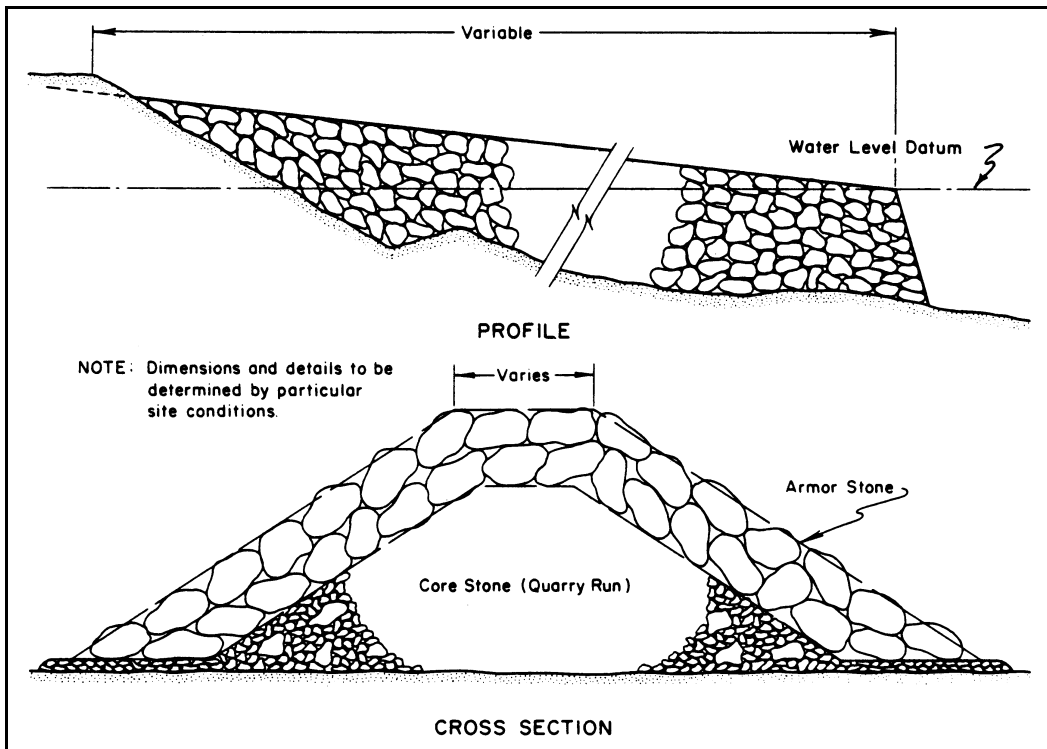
Rubble-mound groin, Westhampton Beach, New York
